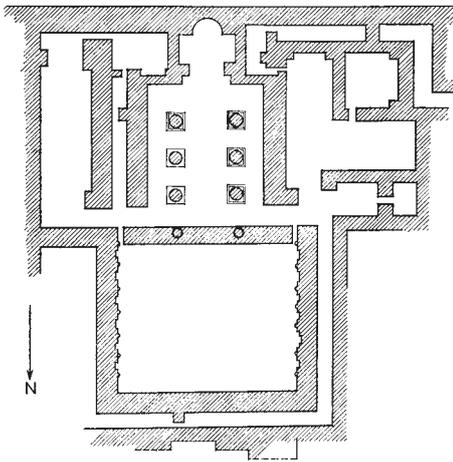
Kish, columnar hall with axial room («Palace II»), ground plan. – (After Watelin, Kish fig. 169).
